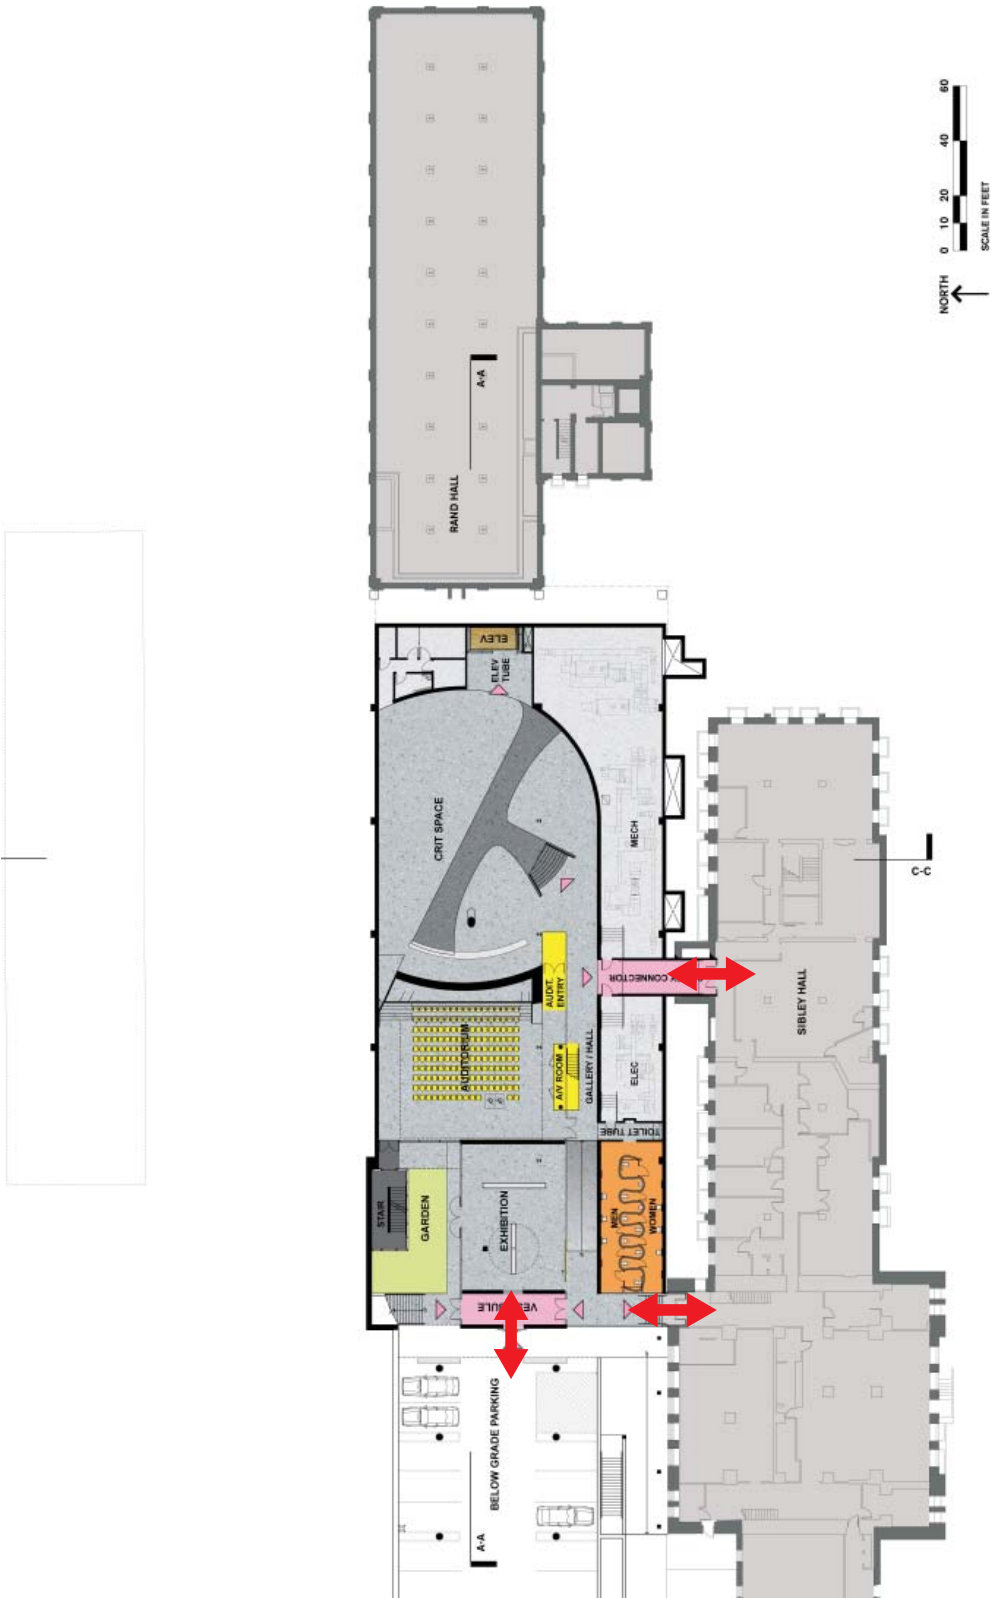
c: Basement Plan: Milstein, Sibley, Rand, and CAPG. Red arrows indicate building connections.
